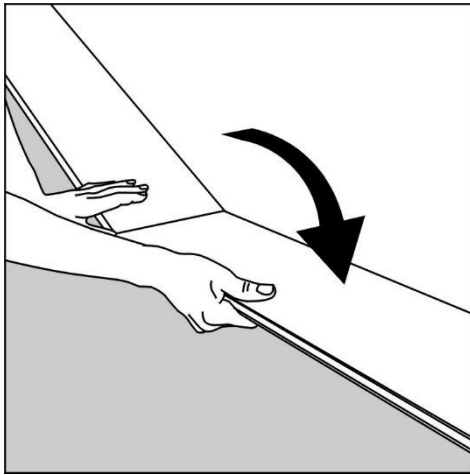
Hold the second plank short end tongue against the first plank short end groove at an angle to engage and press the short ends together. Lay the connected planks flat on the floor. Complete the first row by connecting more planks in the same manner.
